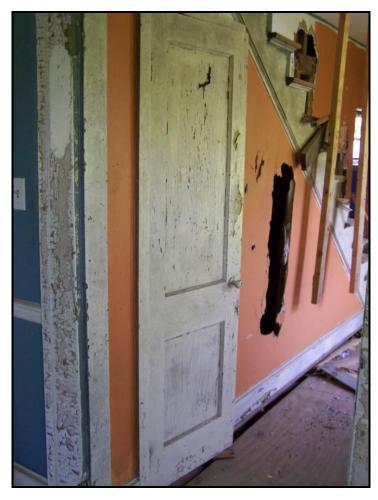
Detail of Door under Stairs in Ell Hallway, View Looking North.
